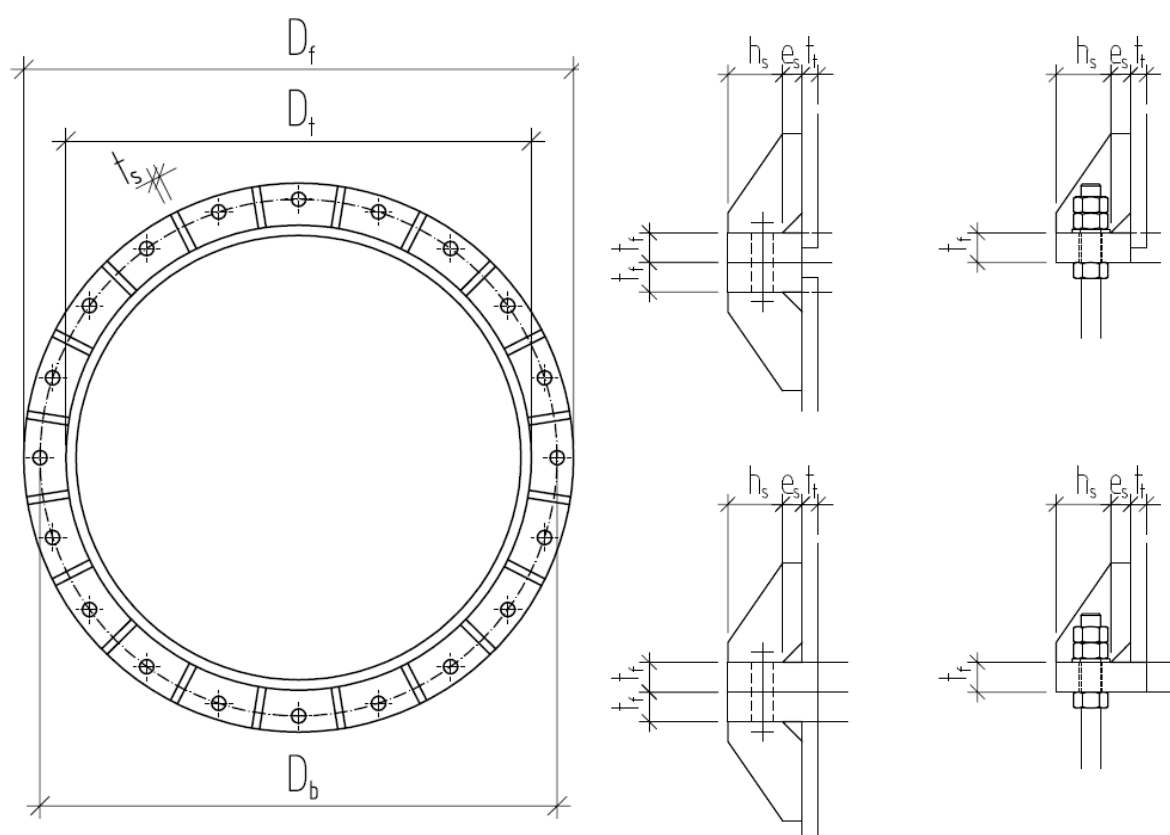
Connection of monopole – bolts outside the tube – plan (left), detail of connection of two panels (middle), detail of base flange (right)
